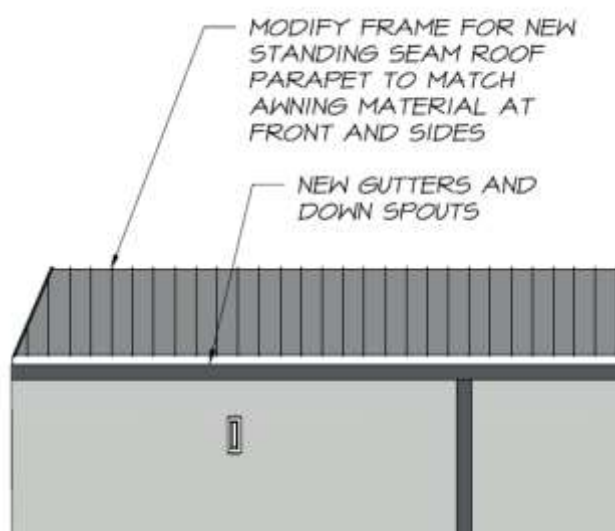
Close-up of the west Elevation showing that the awning will sit above the existing roofline.
